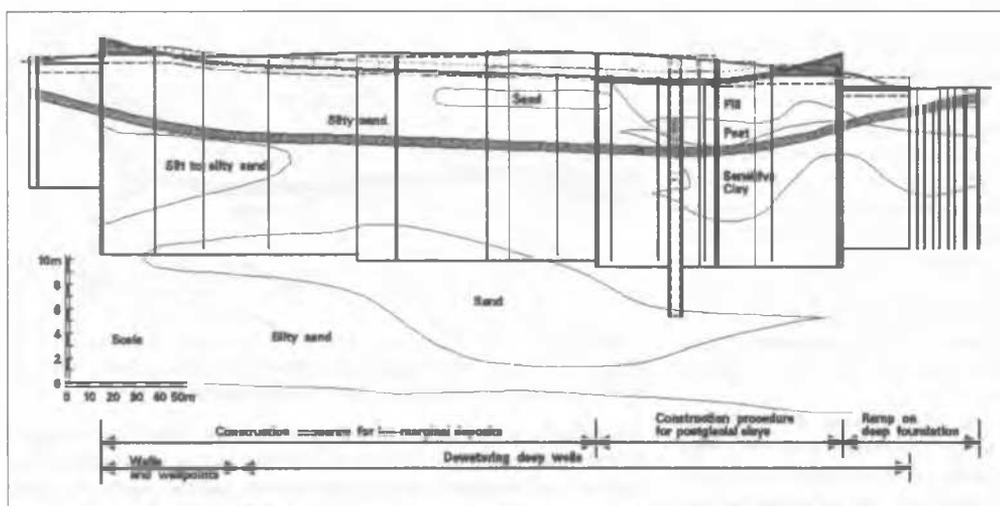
Section along tunnel showing ground conditions, and principal construction procedure.
